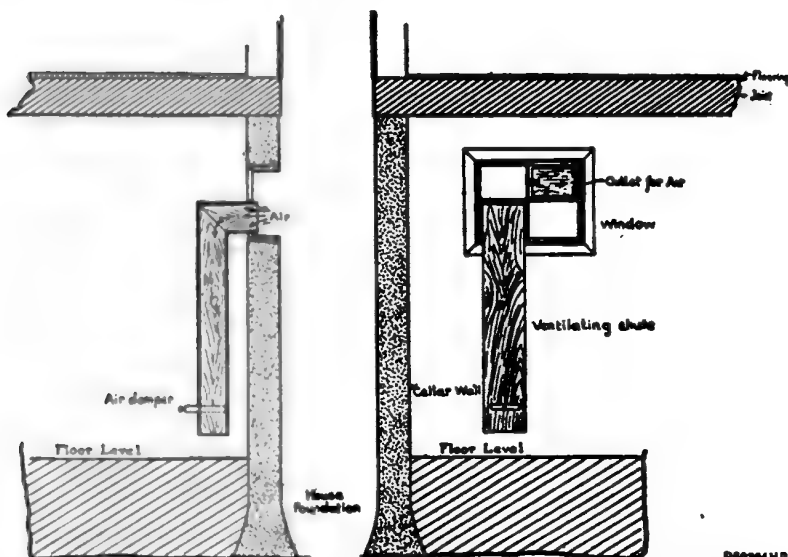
Details of construction for the ventilation of a storage room in a basement. The air duct may be made of wood, terra cotta, or metal and installed in place of a pane of glass, thus avoiding cutting through the cellar wall. A hinged door the size of another pane of glass may serve as an outlet for the warm air.—*U. S. Dept. of Agriculture.
